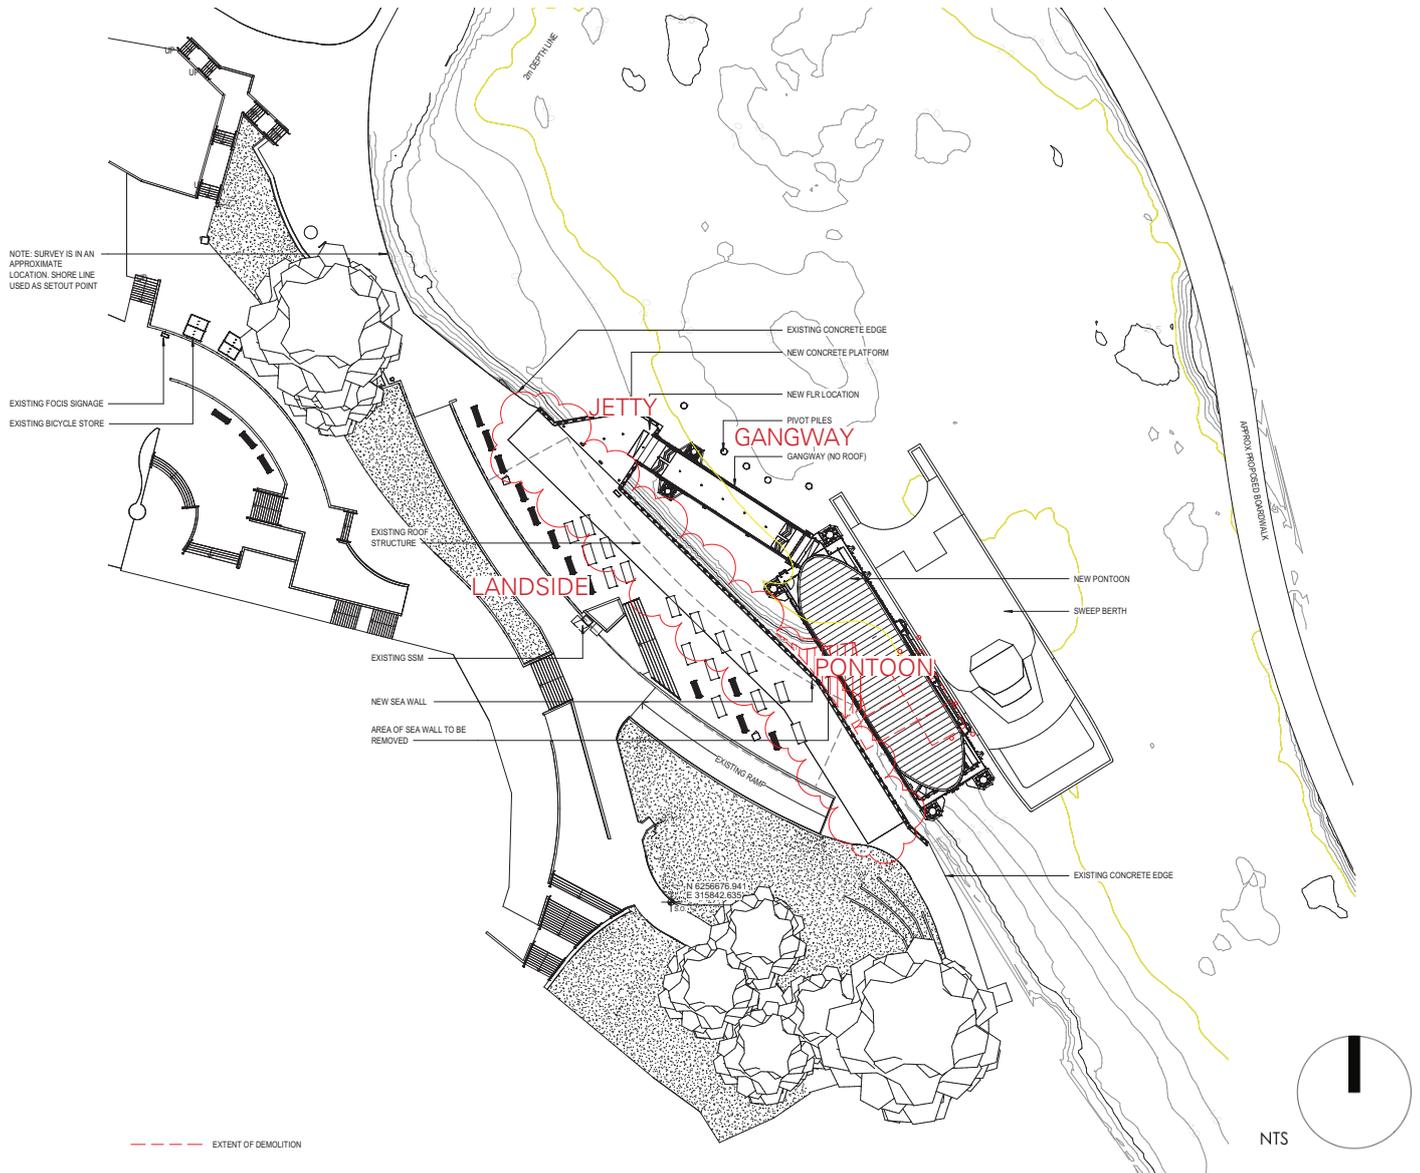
Proposed wharf plan (plan courtesy of Conrad Gargett Ancher Mortlock Woolley)
